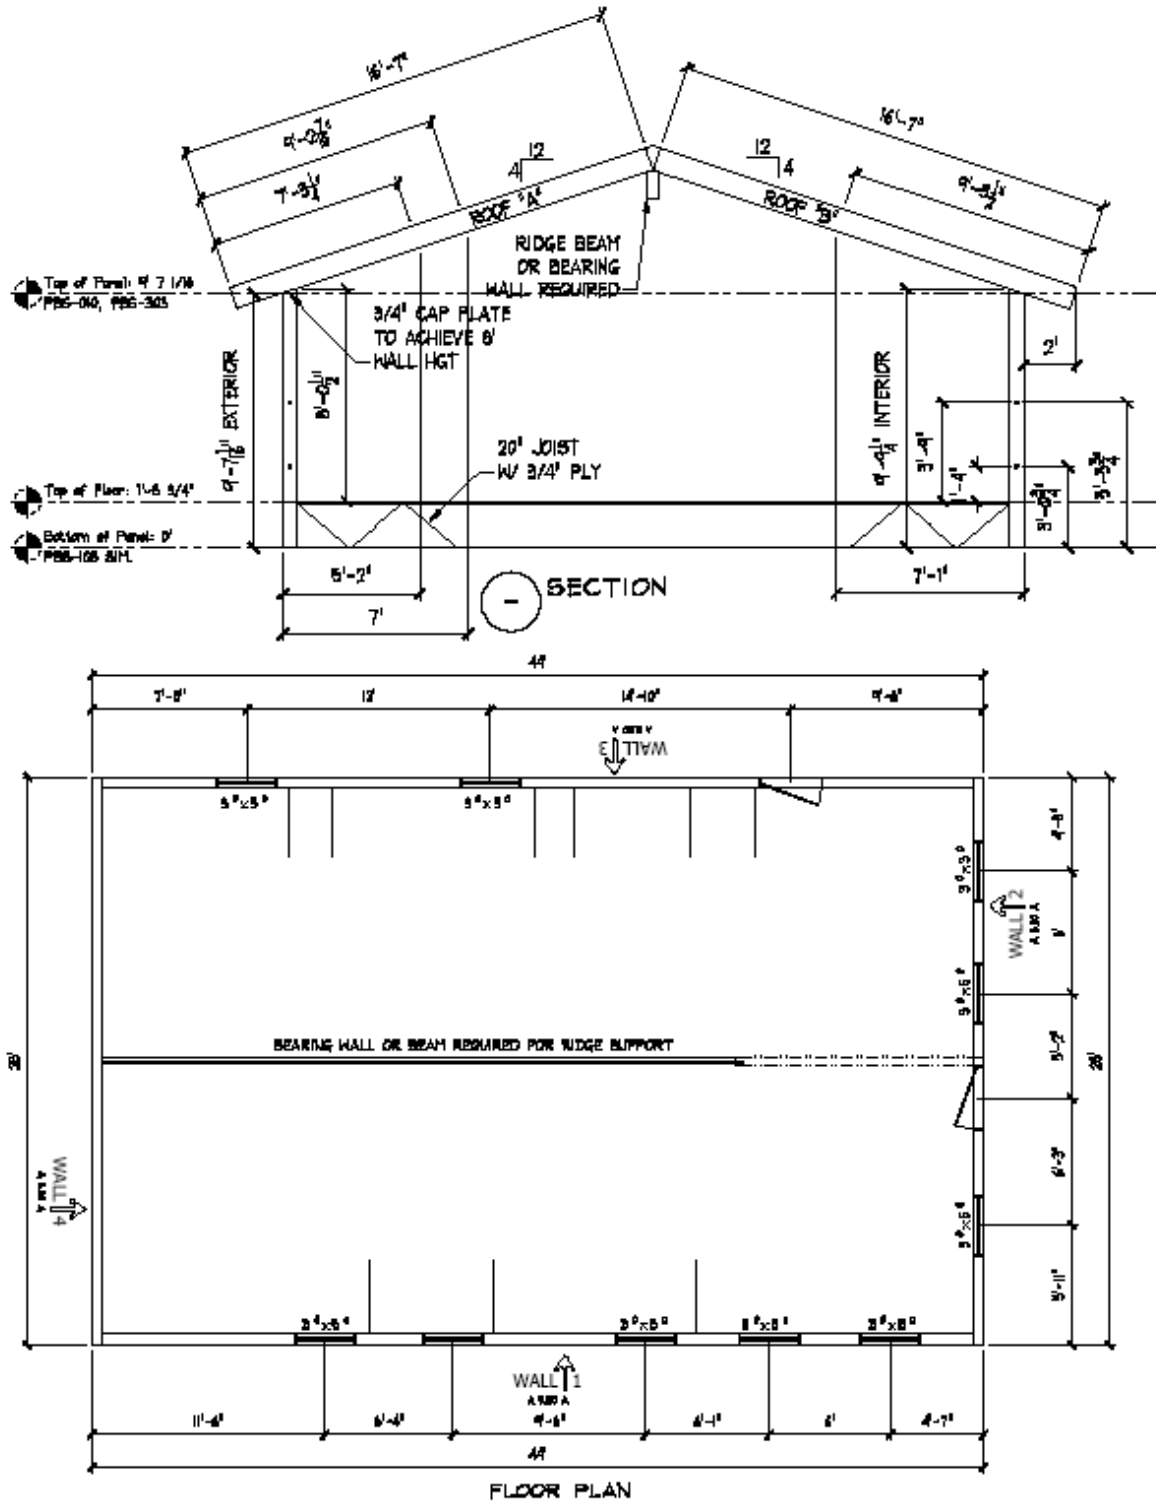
Basic section and structure requirements. The extended overhangs are SIPS, which provides substantial labor savings compared to site-assembled roof extensions. The drawing shows a partial ridge beam and bearing wall. The house was constructed with a continuous ridge beam with two intermittent
